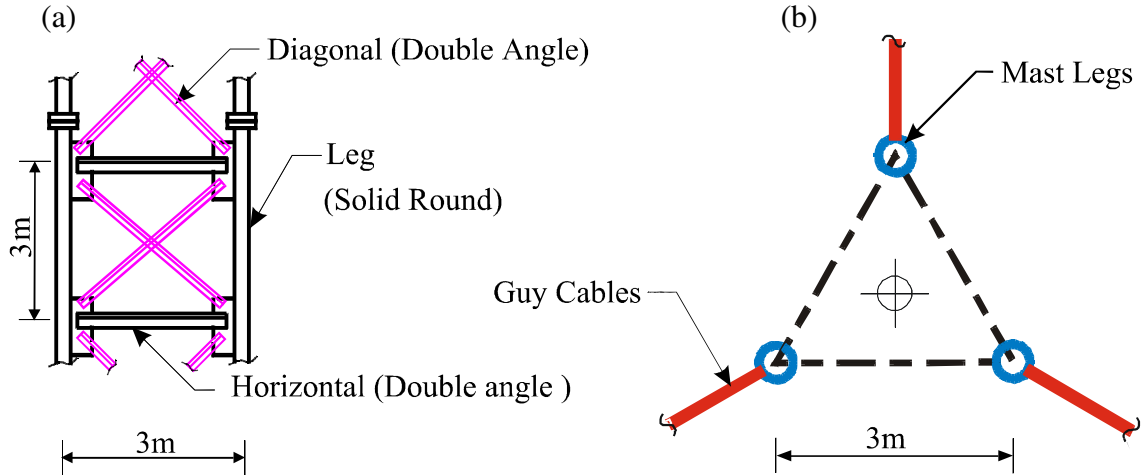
Typical guyed mast configuration: (a) elevation of typical mast panel; and (b) horizontal section.
